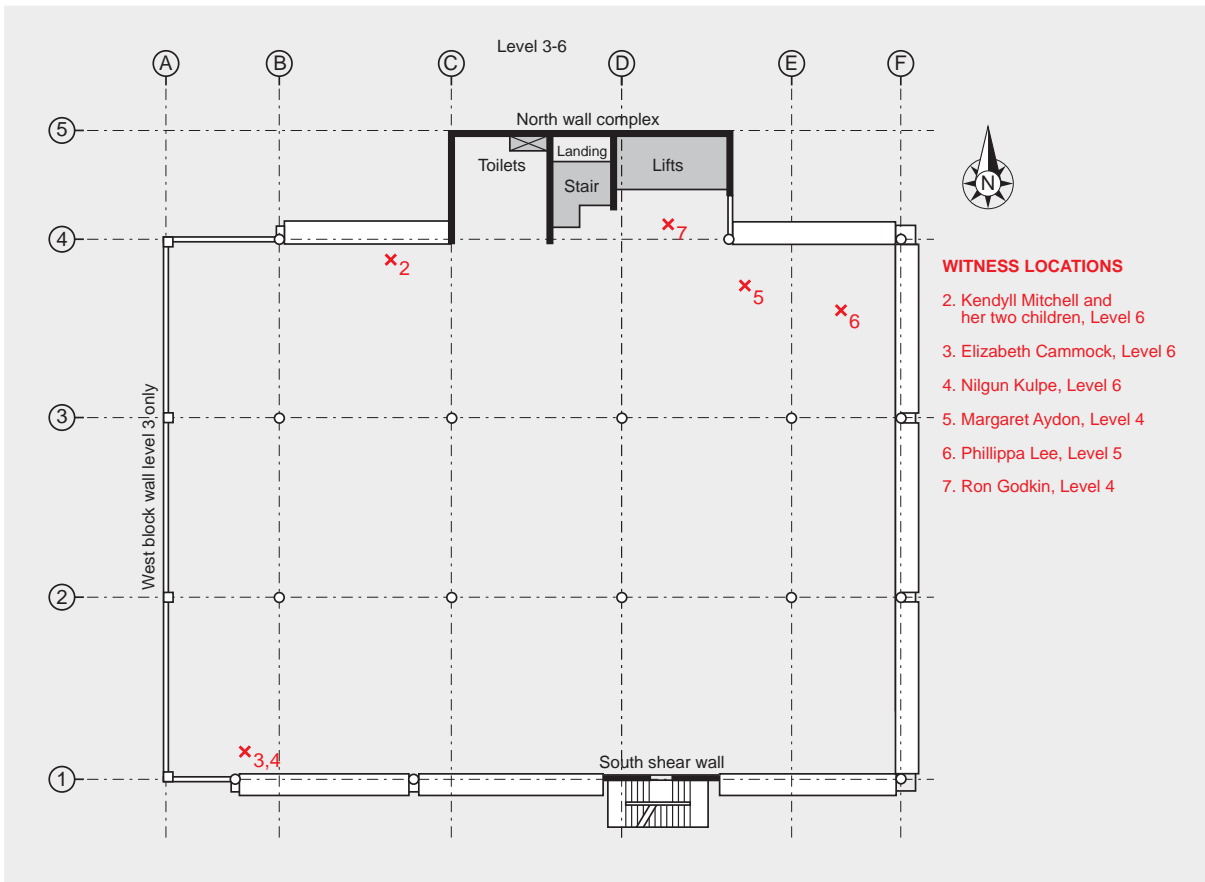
Floor plan for levels 4, 5 and 6 showing the location of witnesses
